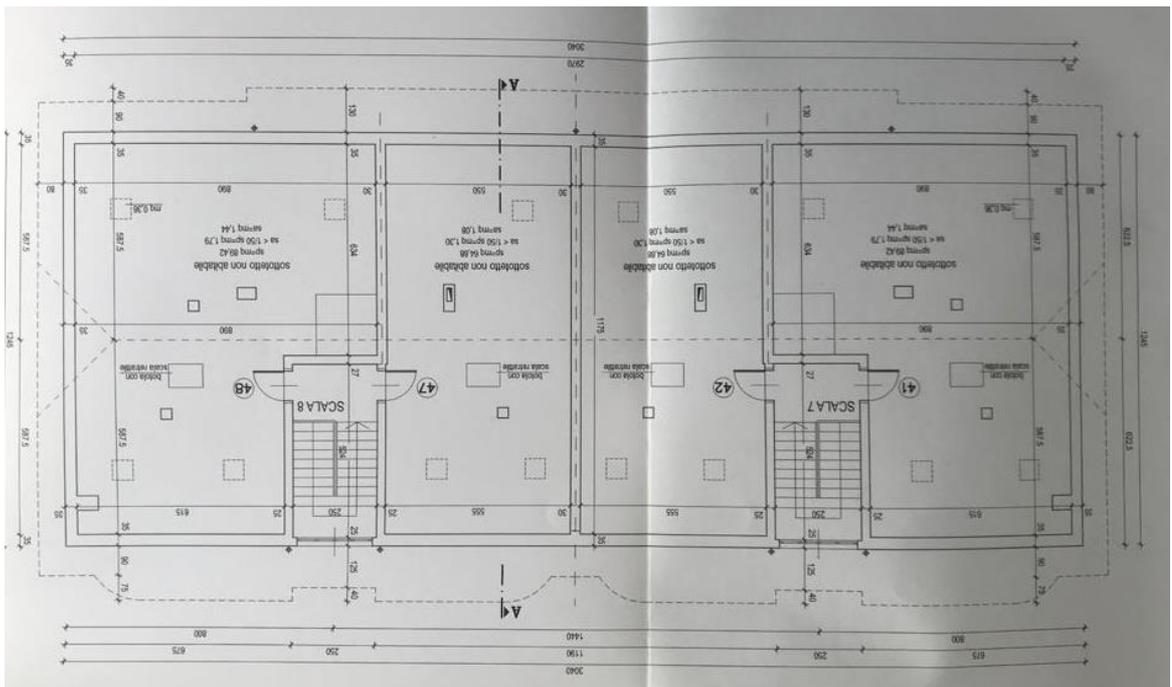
Attic floor plan (Via S.Francesco da Paola 5)
